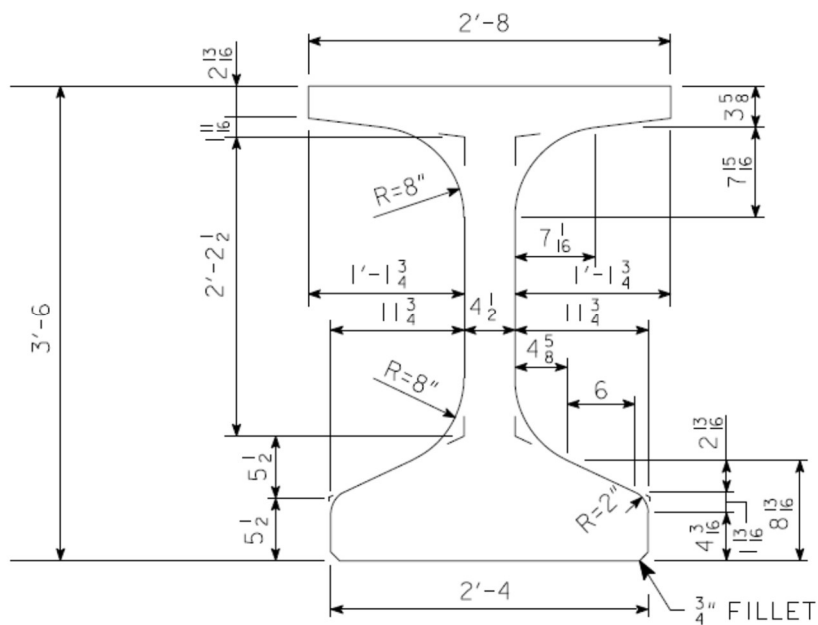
Cross Section of Mars Hill Bridge UHPC Girder (Bierwagen, et al., 2010)
